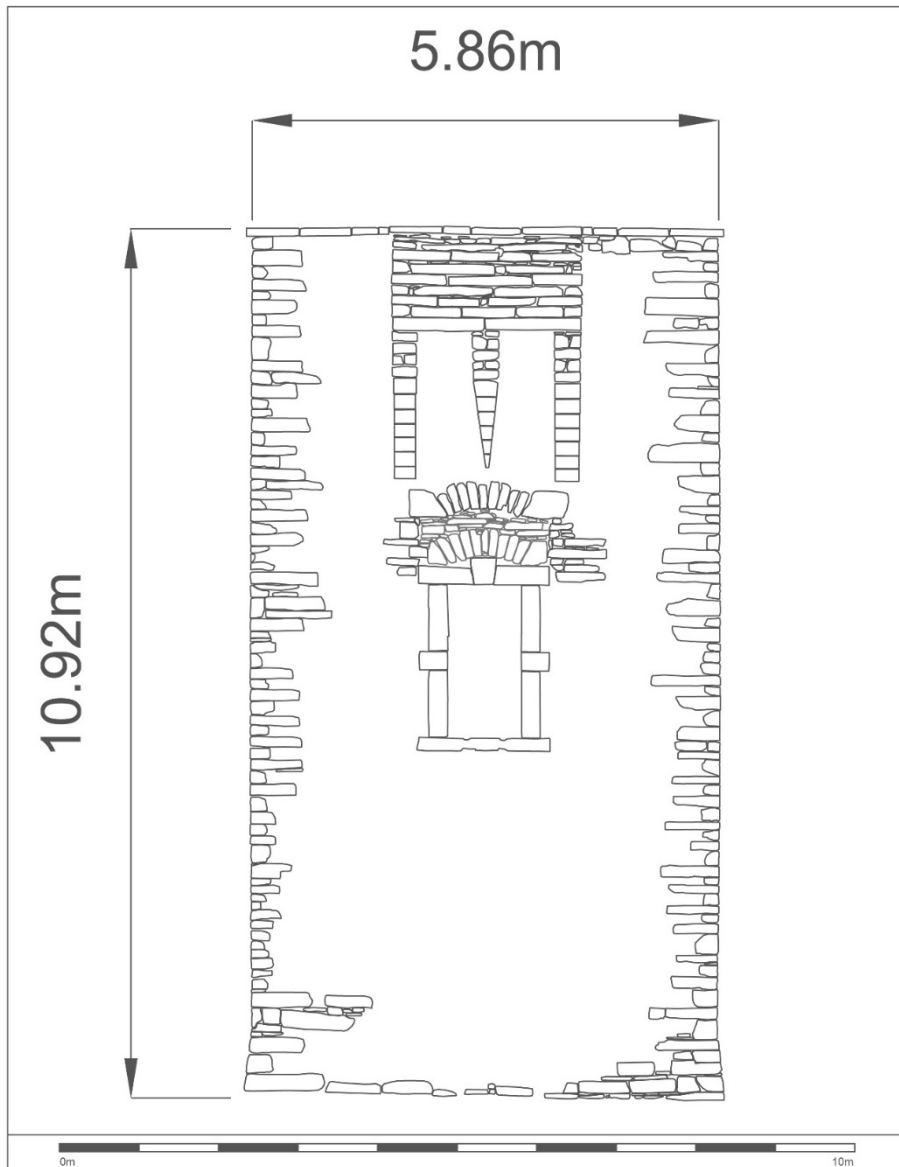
External elevation of the south-west wall of the signal tower at Malin Beg Signal Station.
